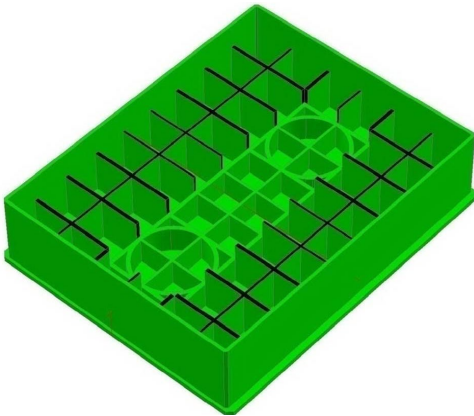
3D model of the Caisson Construction at Dry Dock and water in-taking to the Dry Dock to prepare Caissons for Initial Launching. Courtesy of STFA Construction Co.
